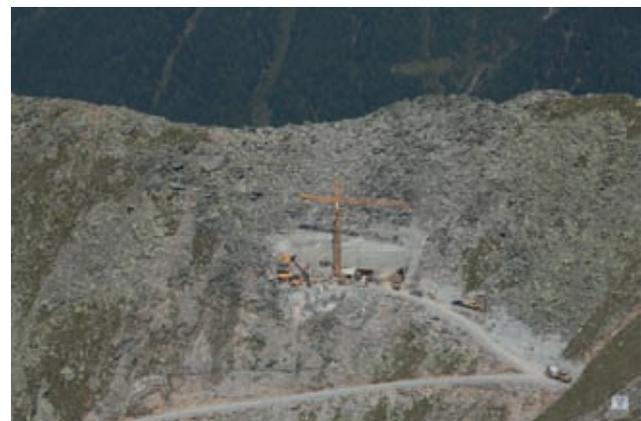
Preliminary cut shaft head of Schoberboden surge chamber
